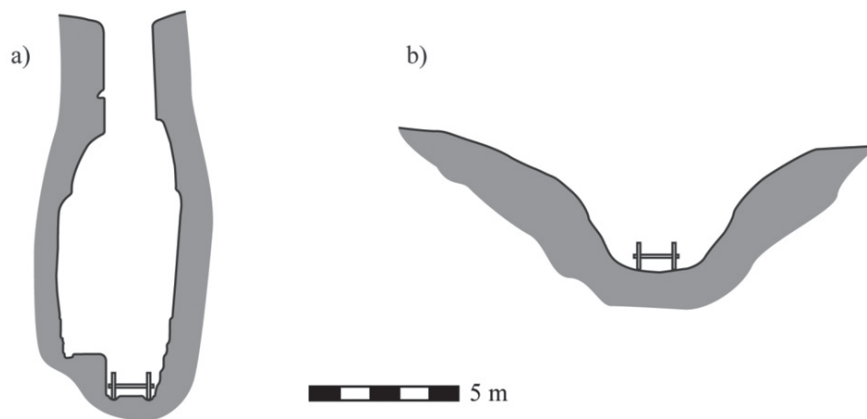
The deep-mined road cuttings, *vie cave*, naturally placed more concrete restrictions than more open, gentle-sloped cuttings. The sections presented above are from a) Fantibassi road cutting near Civita Castellana and b) Trincea viaria road cutting at Crustumerium (section based on documentation on site in 2005).
